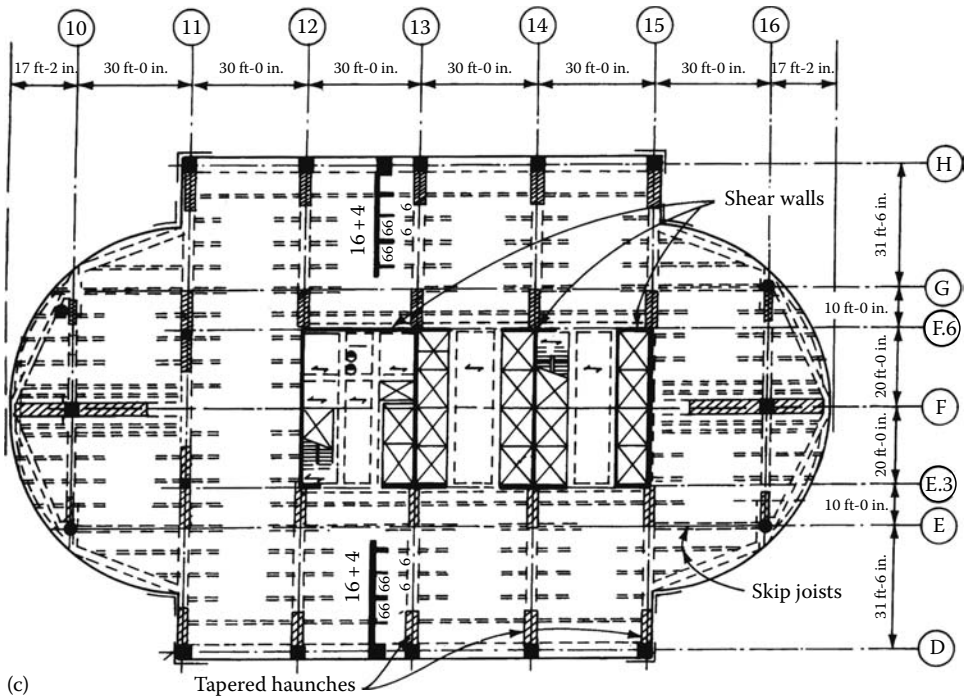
(continued) (c) levels 27 through 39 floor plan, (d) levels 40 through 47 floor plan,
